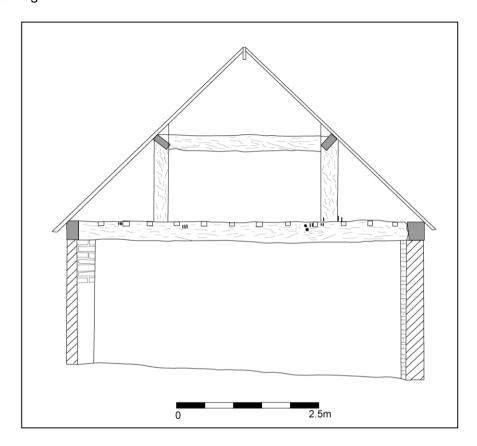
Section looking E showing queen-post roof construction in Barn 3
